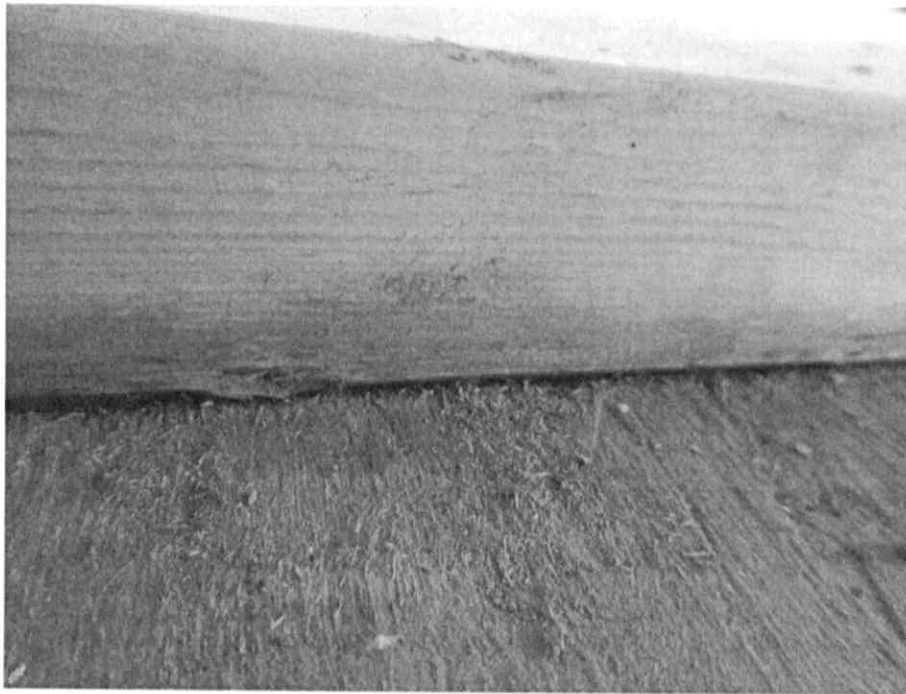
View of water stains at the bottom edge of a wood plate at interior partition wall.
